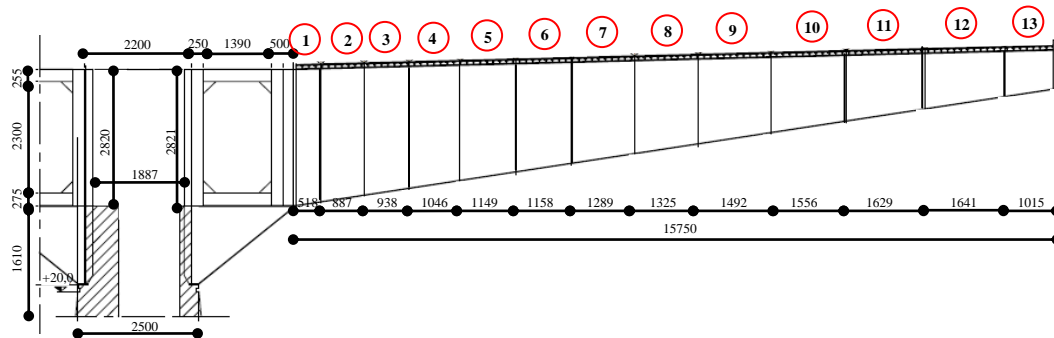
Upper section of a R/C column and relevant steel drum, and view of a triangular bearing plate and a type 1 cantilever beam (dimensions in millimeters)
